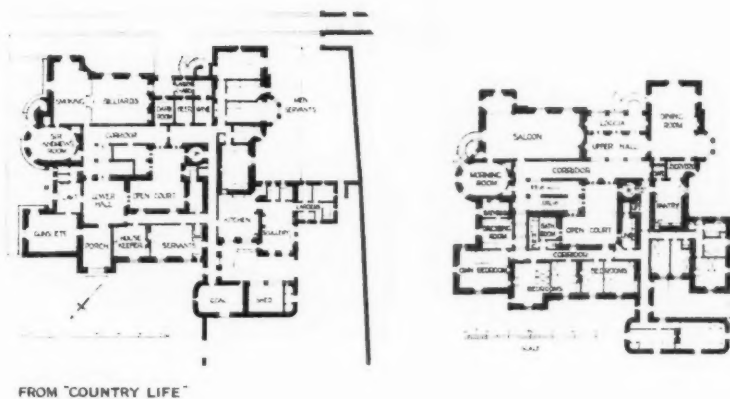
ARDKINGLAS. Ground and First Floor Plans
